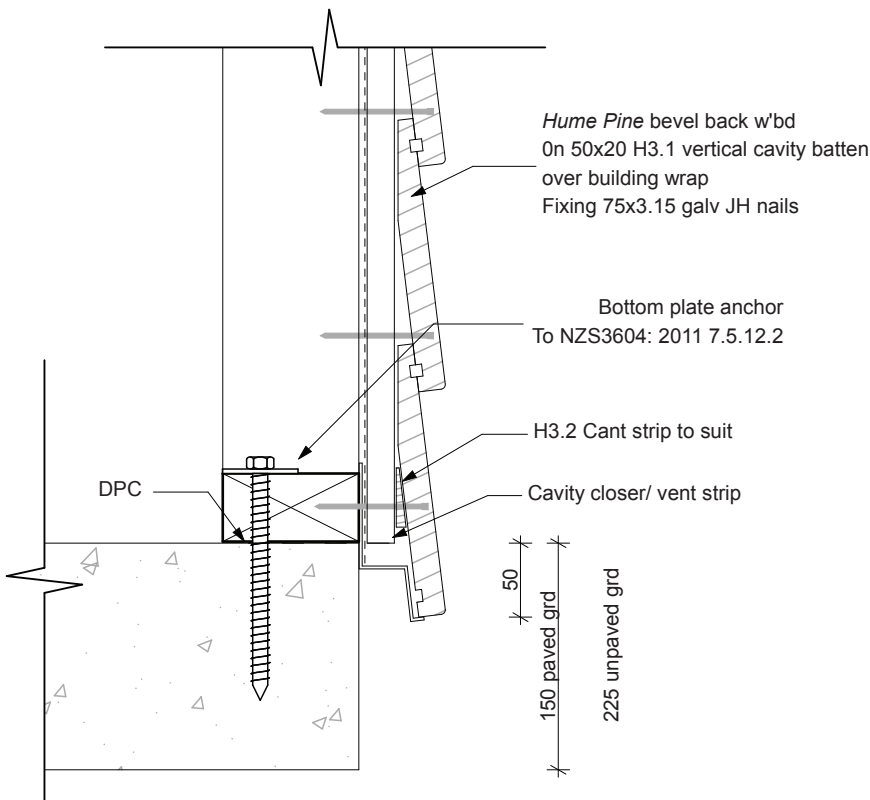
BB, CF Sill Timber Floor | Scale 1:5
